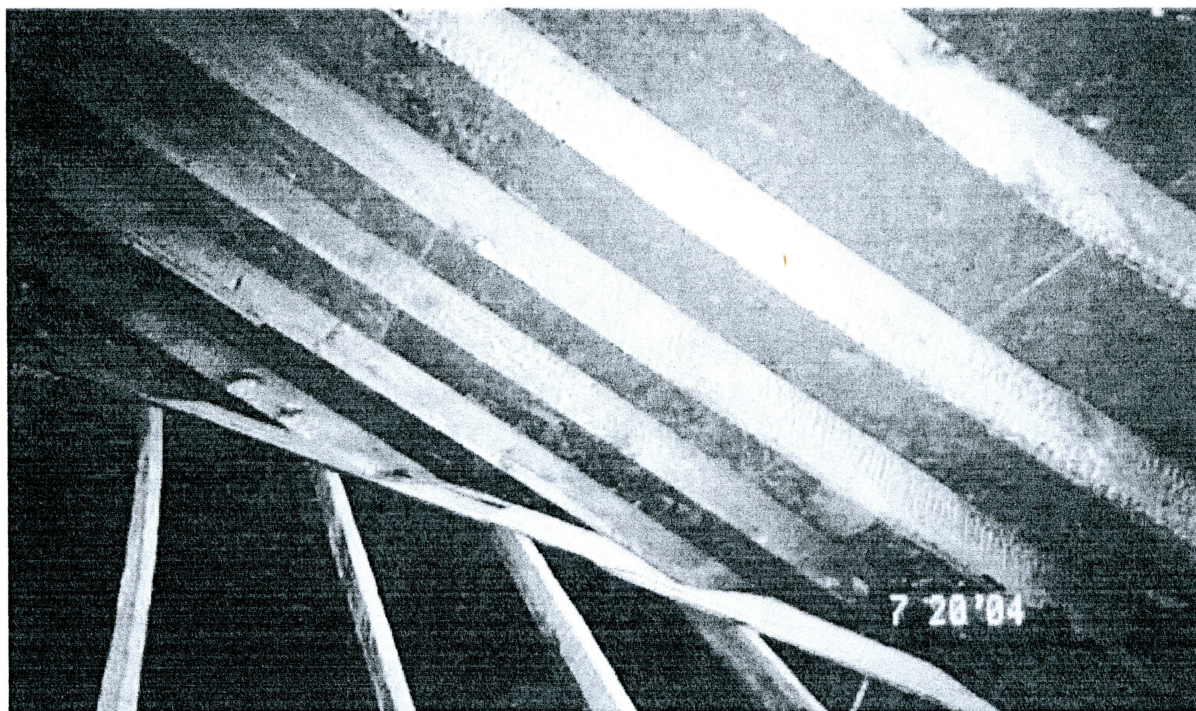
(Second Floor – Typical Wall Condition)
